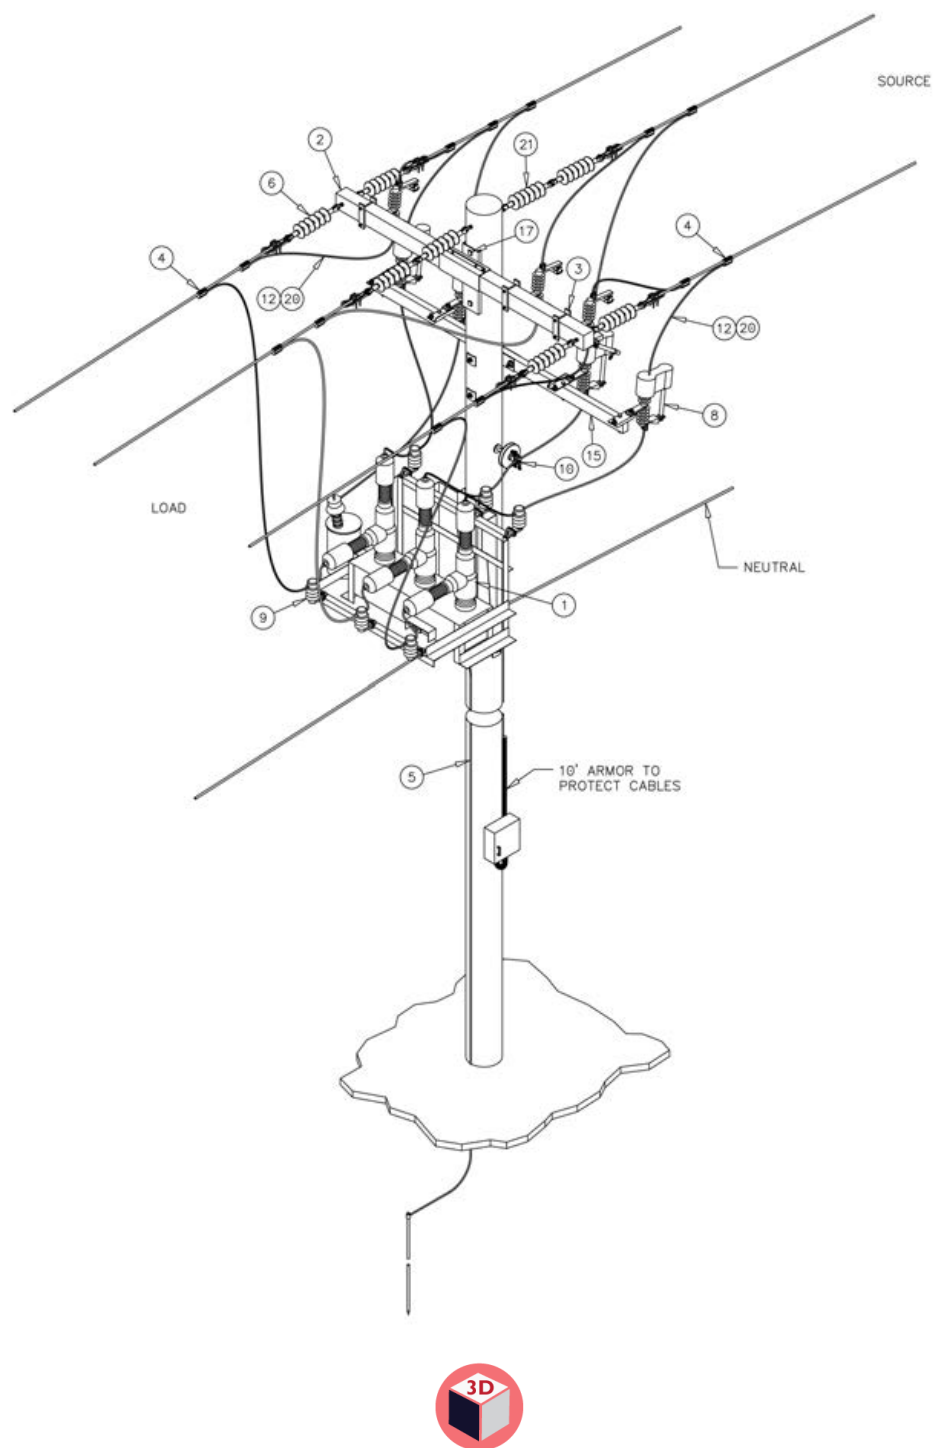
Typical Recloser Assembly, 200 A Maximum Load, Isometric View
